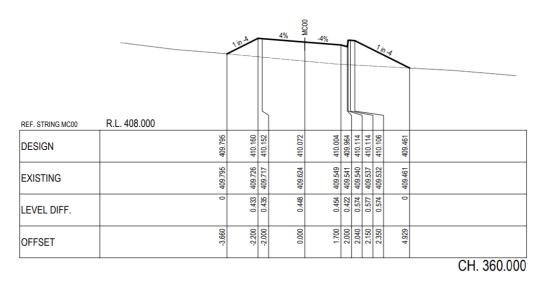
Cross section of proposed driveway (source: MLEI design plans)
